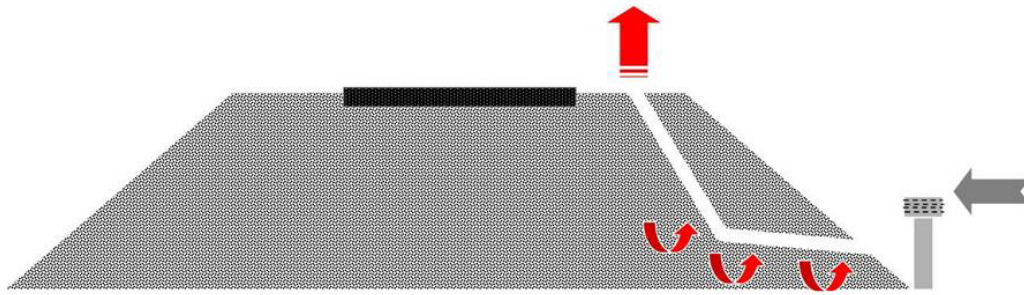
Heat drain placed in the shoulder of a road embankment (Beaulac, 2006)
